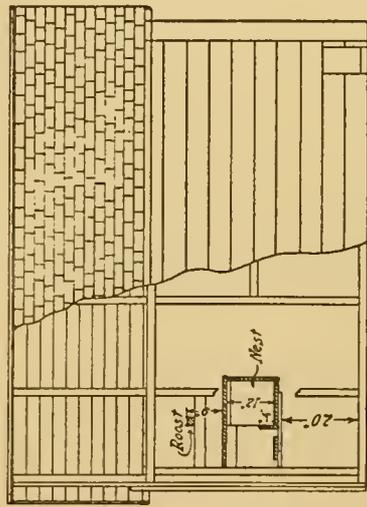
SIDE VIEW SHOWING CONSTRUCTION
